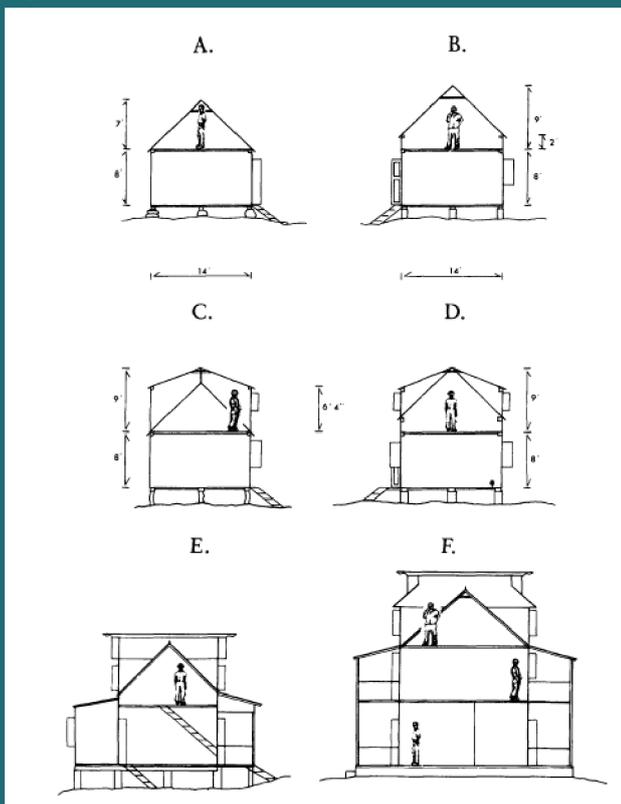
The relations between loft types and roof types, as seen in section views. A. low-loft MLA0 cottage; B. double-wall-plate (parapeted) cottage, MLB0; C. pack saddle expansion, MLA1-P; D. shed-roof cottage, MLB1-S; E. MLB1-G "garrer" expansion; F. MLA1-H "hip-and-gable" expansion.
